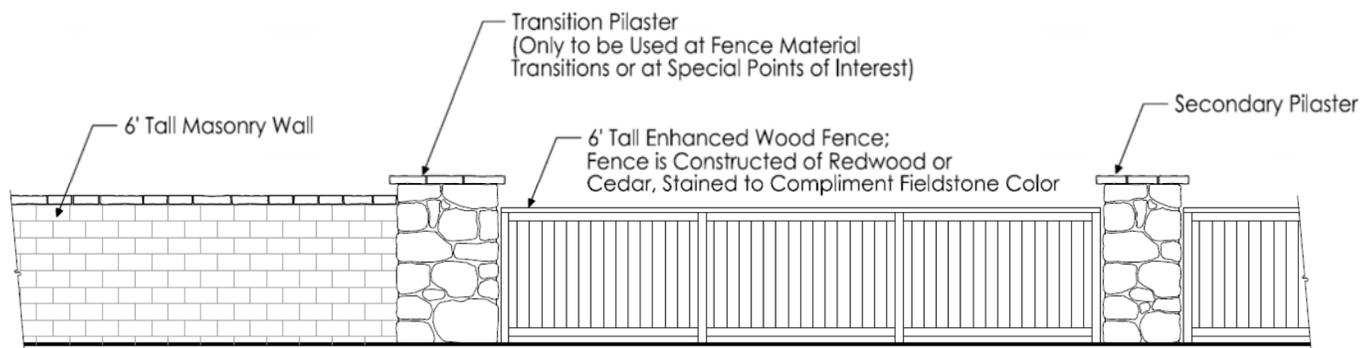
| Masonry Wall and Enhanced Wood Fence
